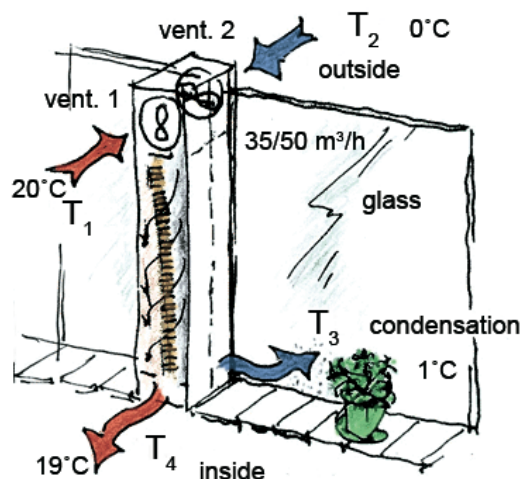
The breathing window can be a jamb mullion or built in a wall
